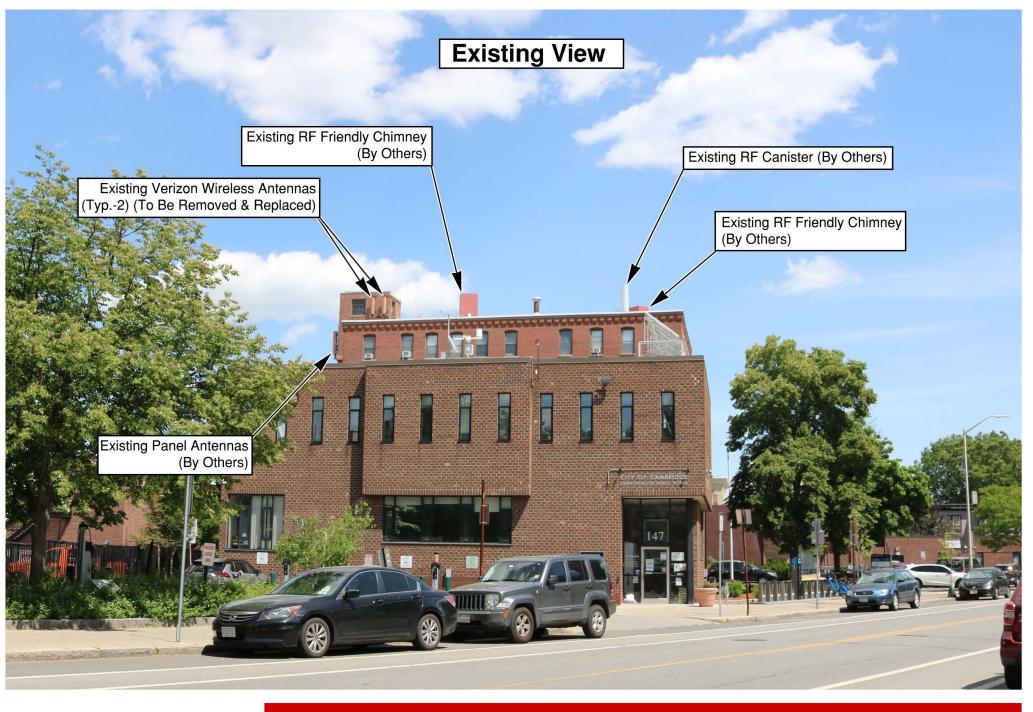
A View Facing East From Hampshire Street (Page 5 of 9)
